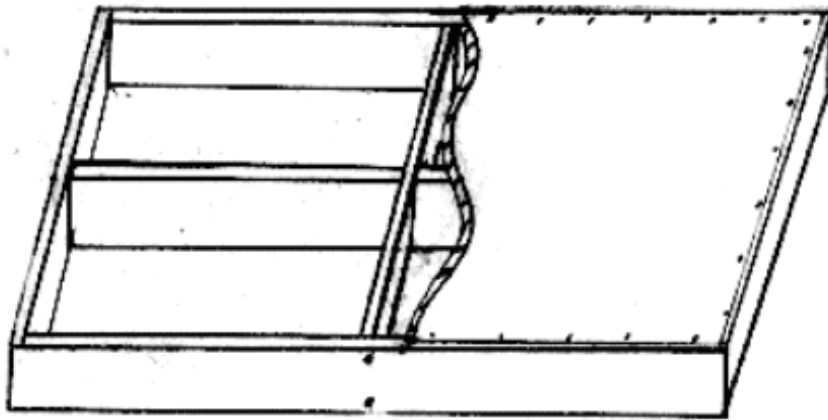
Construction of a typical platform. 2 inch lumber is used for the frame and 3/4 inch plywood is used for the top surface.
